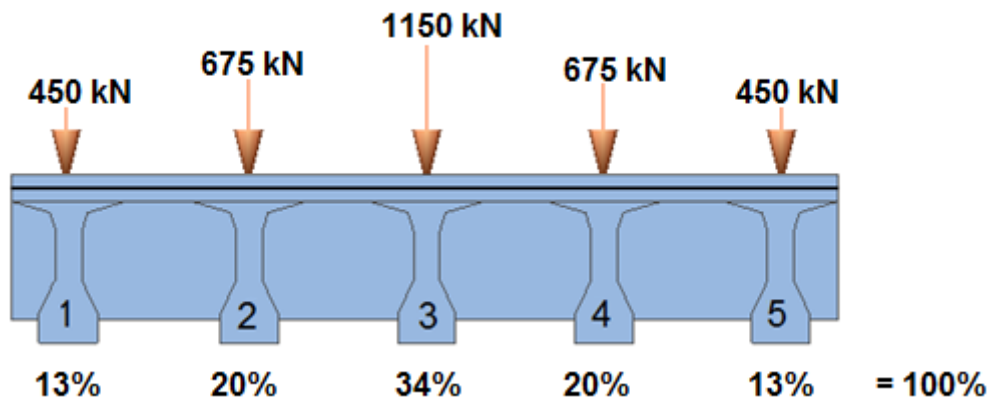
load distribution determined with the tests results, over five girders with the girder load on each beam, for the load at 2.25 m
